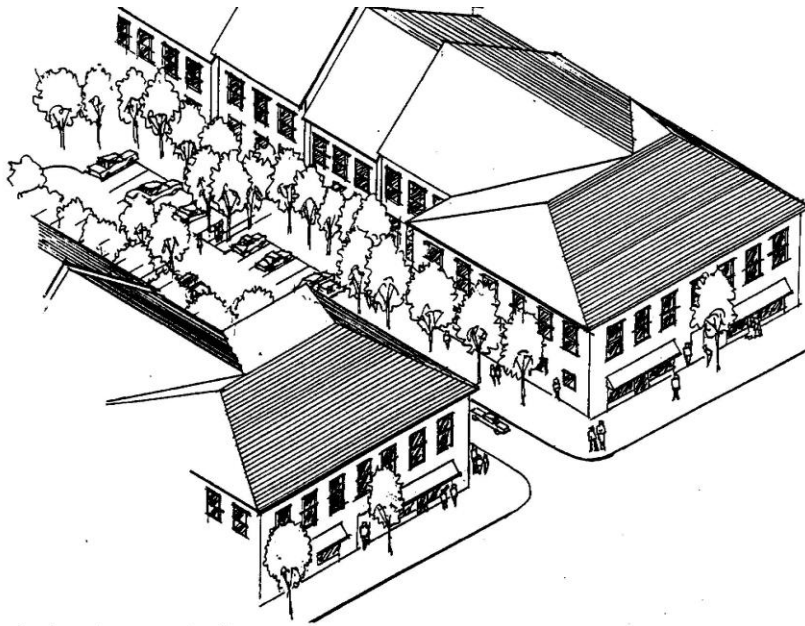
Aerial perspective sketch of a mixed-use area integrating commercial (ground floor) and residential (second story) uses. A relatively narrow gap in the continuous street wall (created by the mixed-use buildings) provides access from the street to a landscaped, pedestrian-friendly parking lot.
